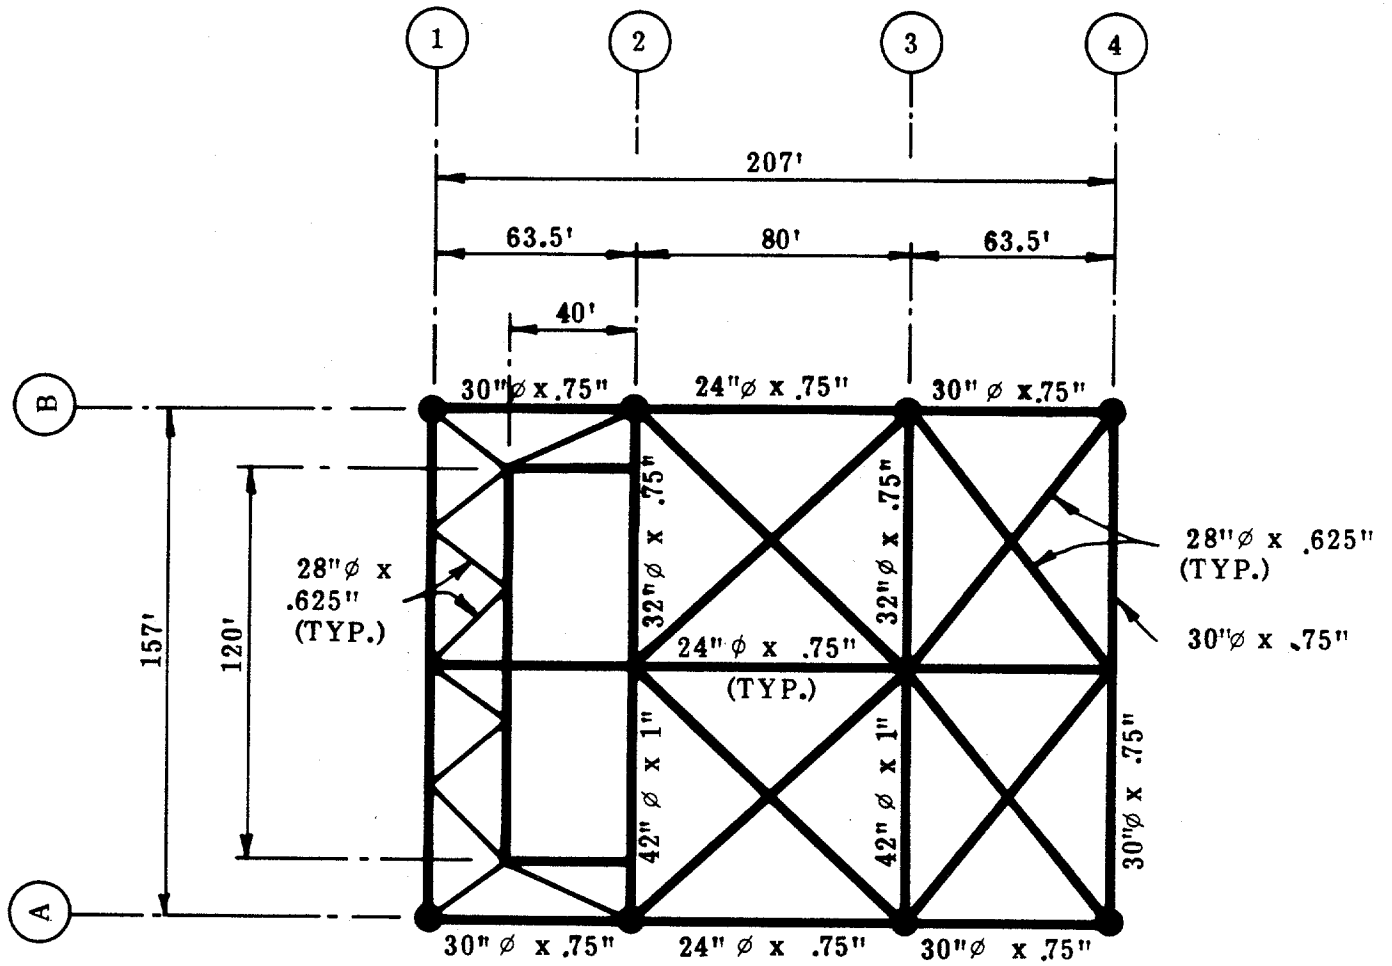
SINGLE PIECE, 150 FT WATER DEPTH PLATFORM, LEVEL 2 @ ELEVATION - 85 FT
